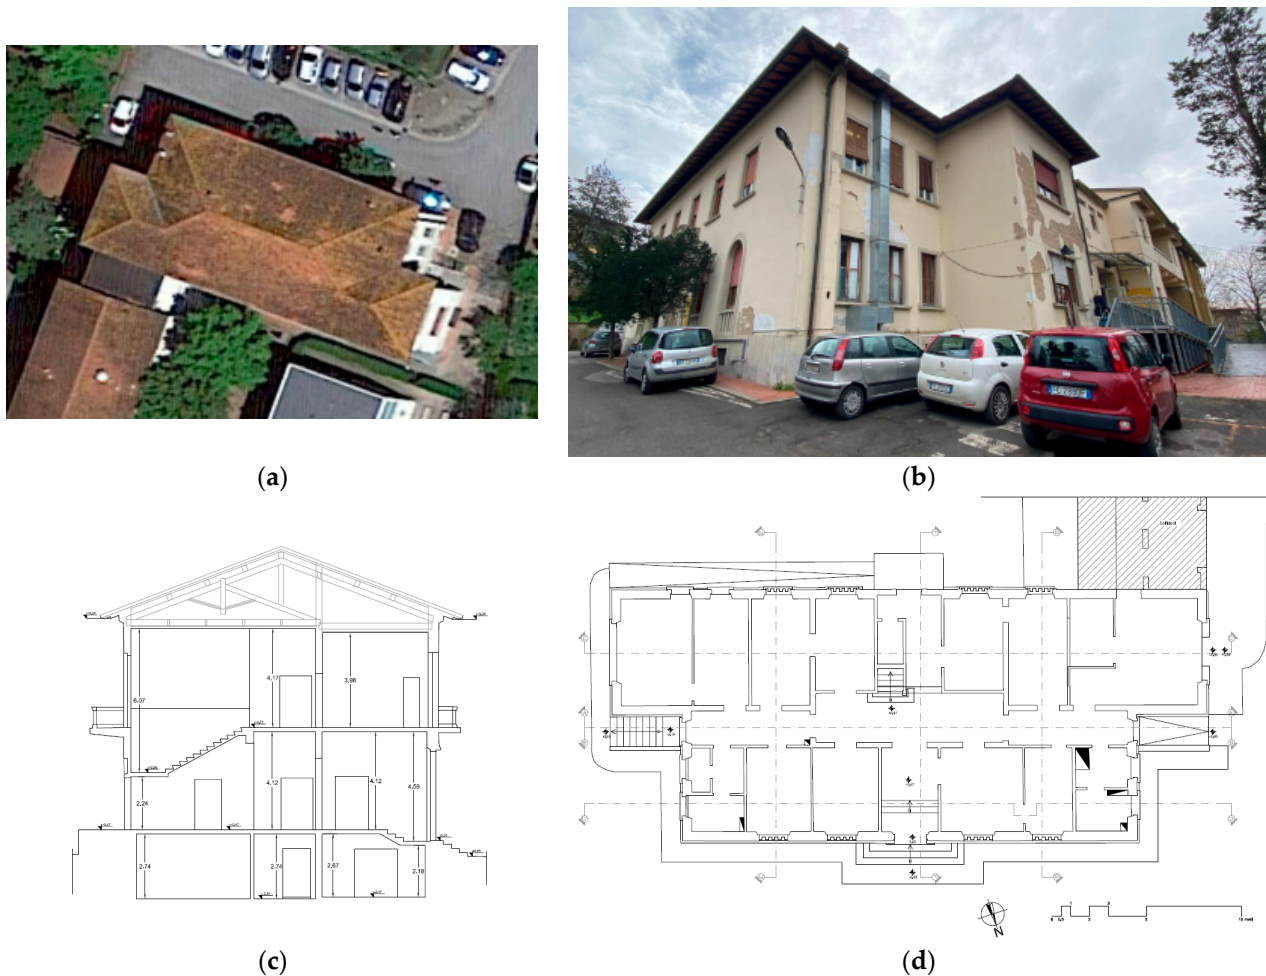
(a) Areal view of the building; (b) image of the structure from the street; (c) architectural transversal section of the construction; (d) ground floor plan.
